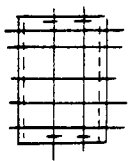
Details of beam unit reference beams C₁ - C₄
